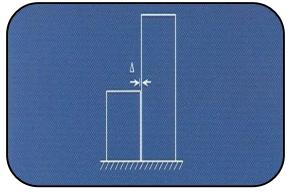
Non-Adjacent Building for Earthquake Prone Area
